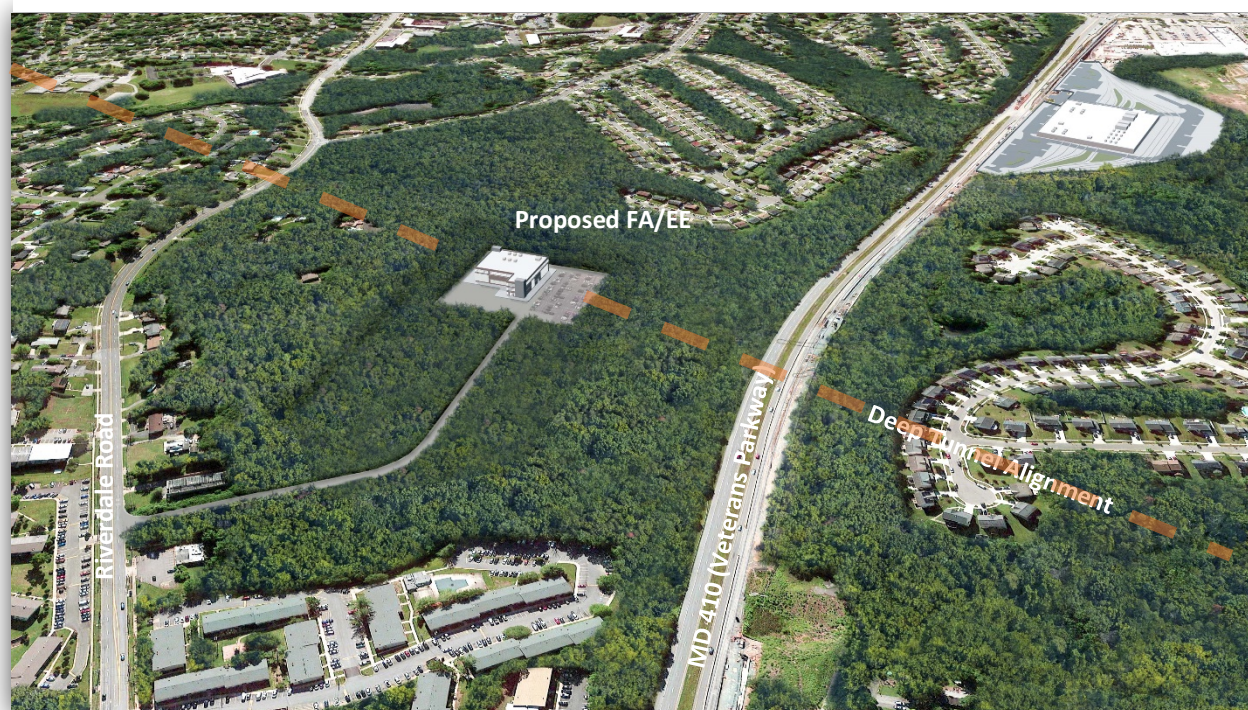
CAA #4 AFTER: Illustrative Rendering of FA/EE Proposed in New Carrollton, Looking East
